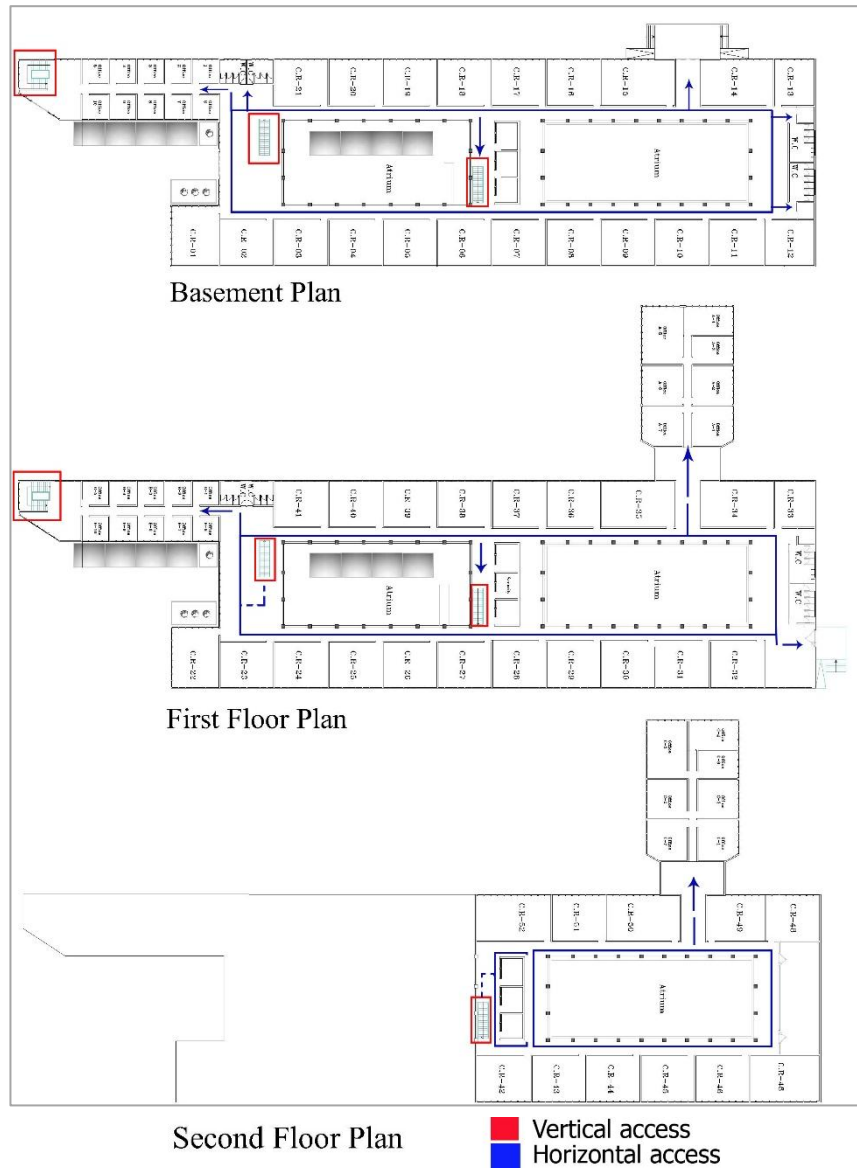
Vertical and Horizontal Access in Techno Park Building
